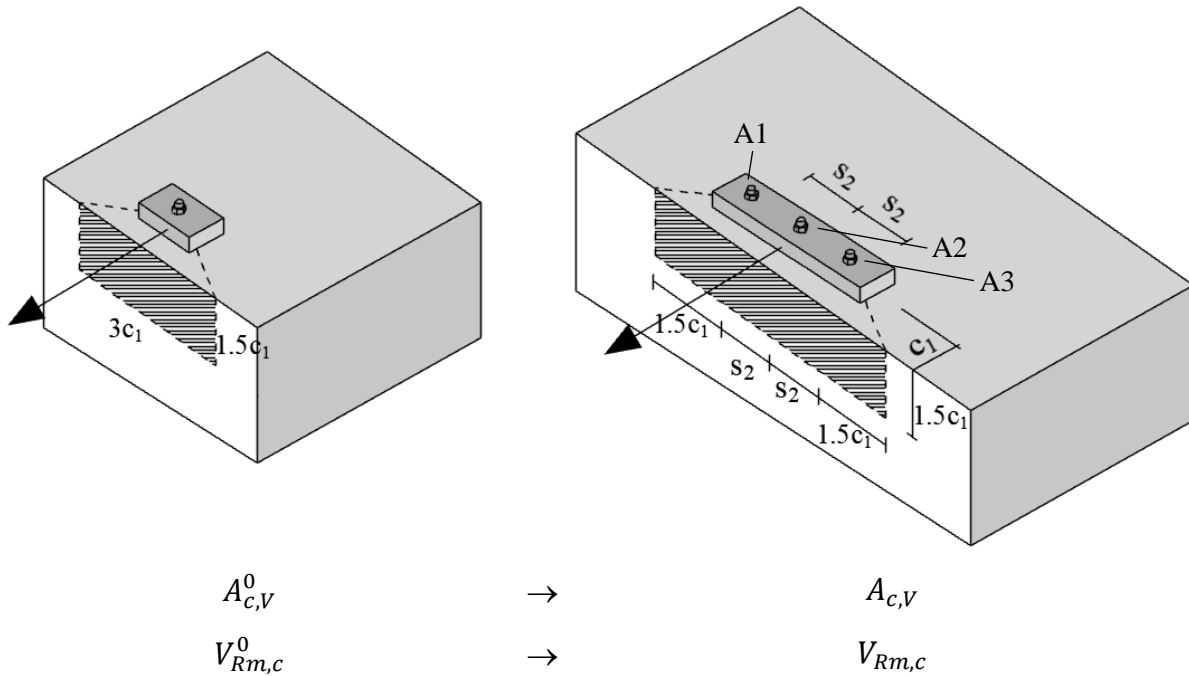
Definition of the projected area of a single anchor (left) and of an anchor group of 1×3 configuration close to one concrete edge (right)
